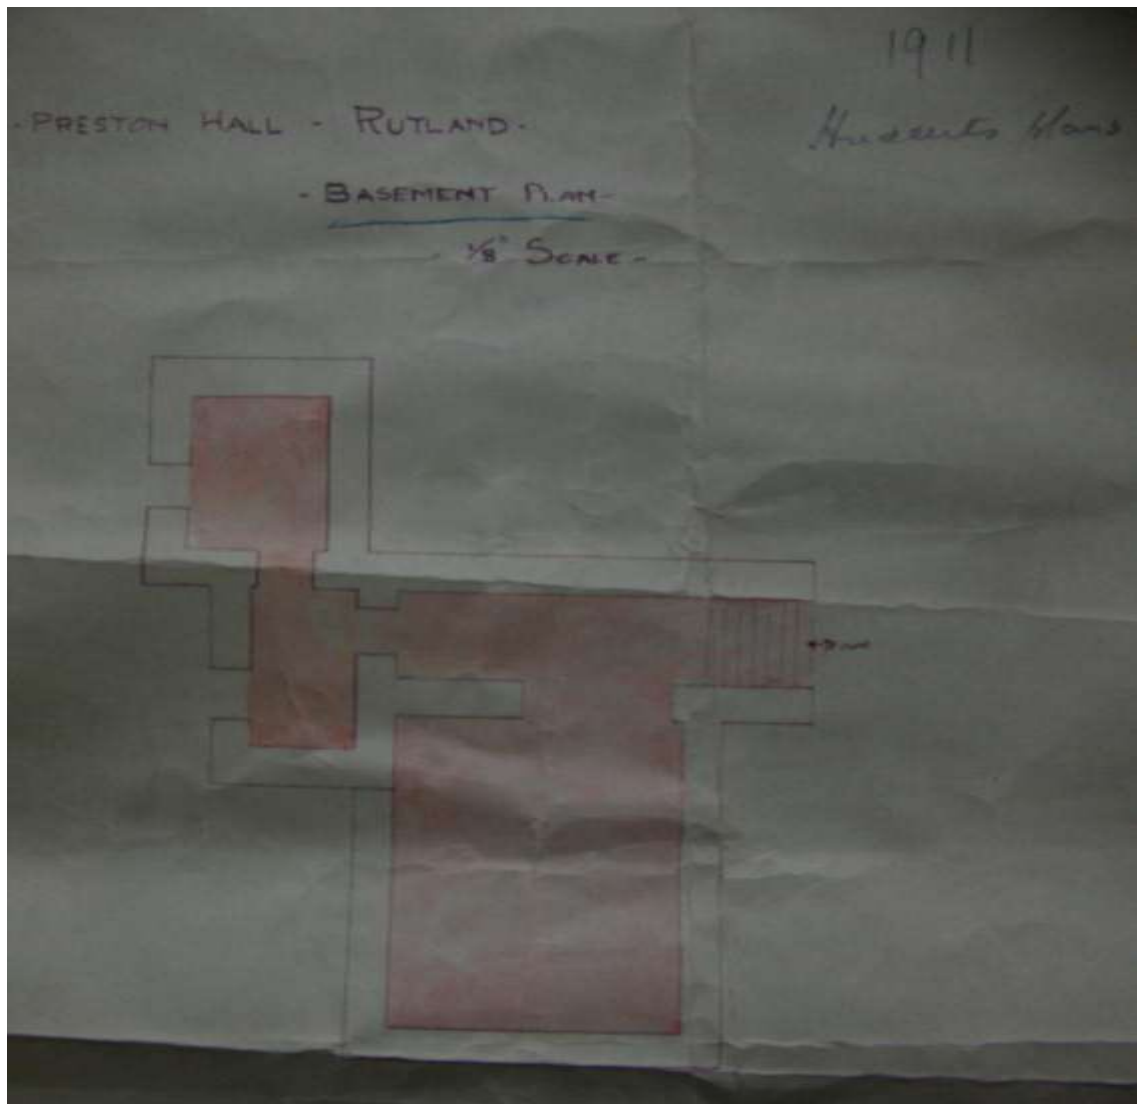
Basement plan of 1911 (Micklethwait family archive)
